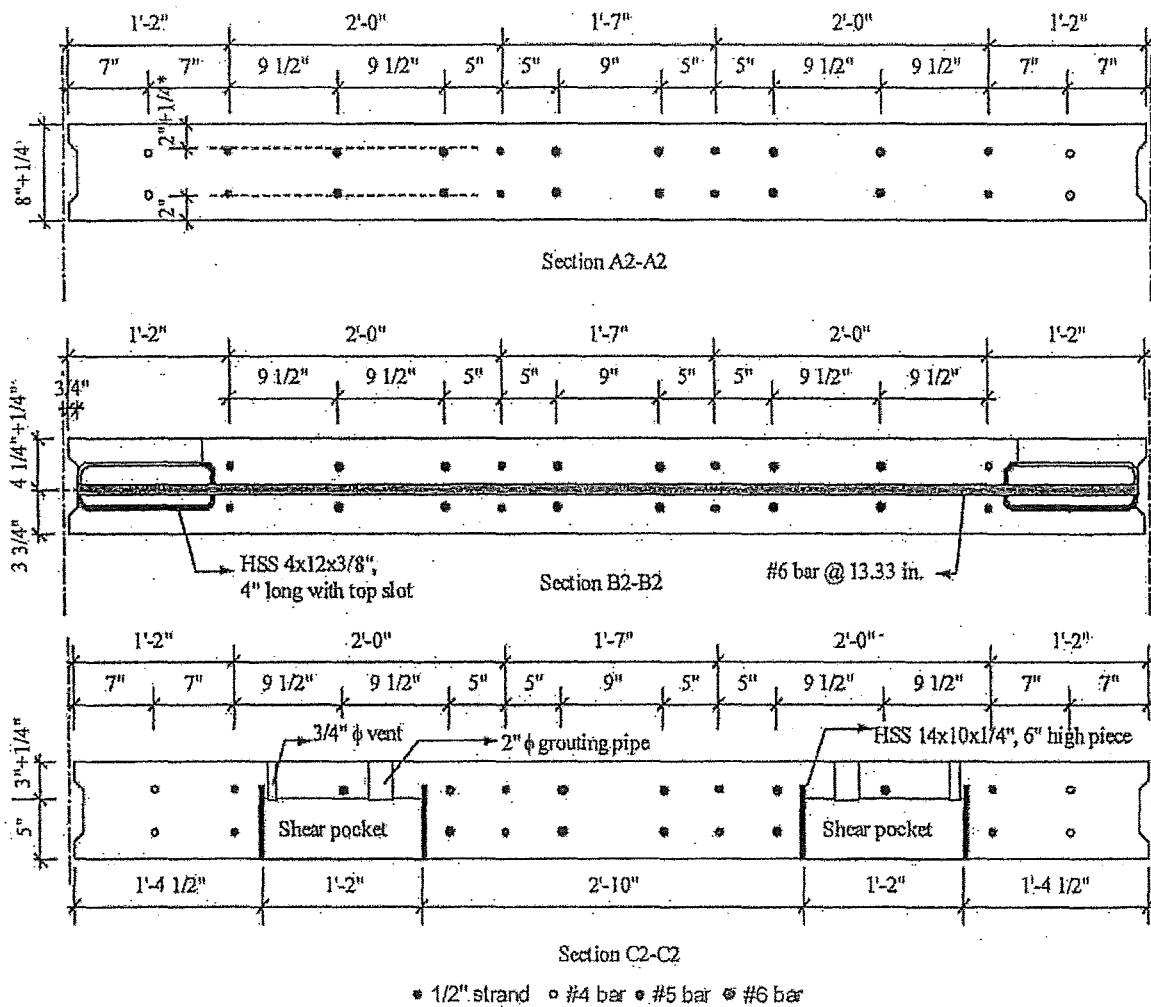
CD-1B, Sections A2-A2, B2-B2 and C2-C2
